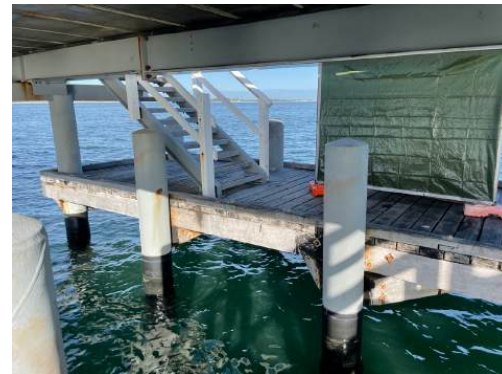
View of fishing platform 5A, Jetty Section 5, Busselton Jetty. H+H Architects, 2022.
